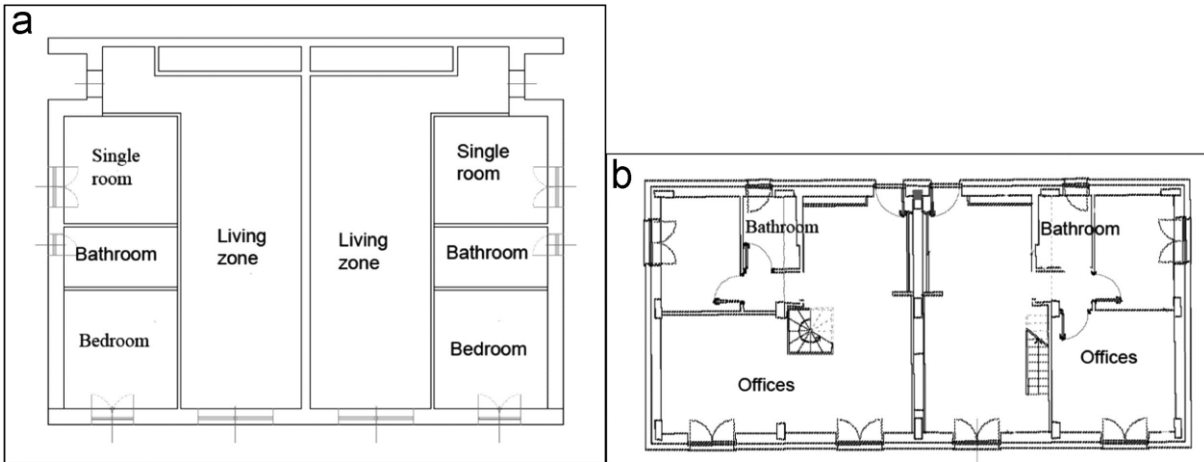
(a) Ground and first floor of the Leaf House. (b) Second floor of the Leaf House (scale 1:200) [155].
